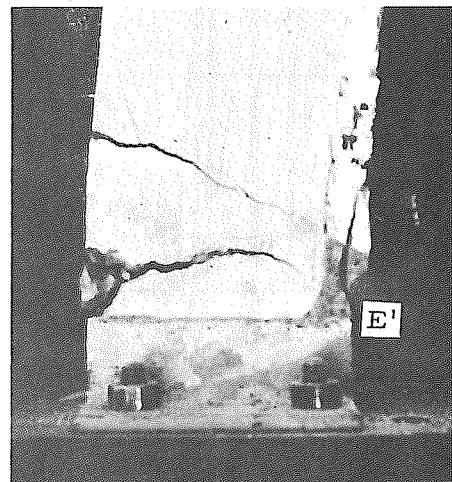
FRAME No. 2 AFTER APPARENT COLLAPSE
